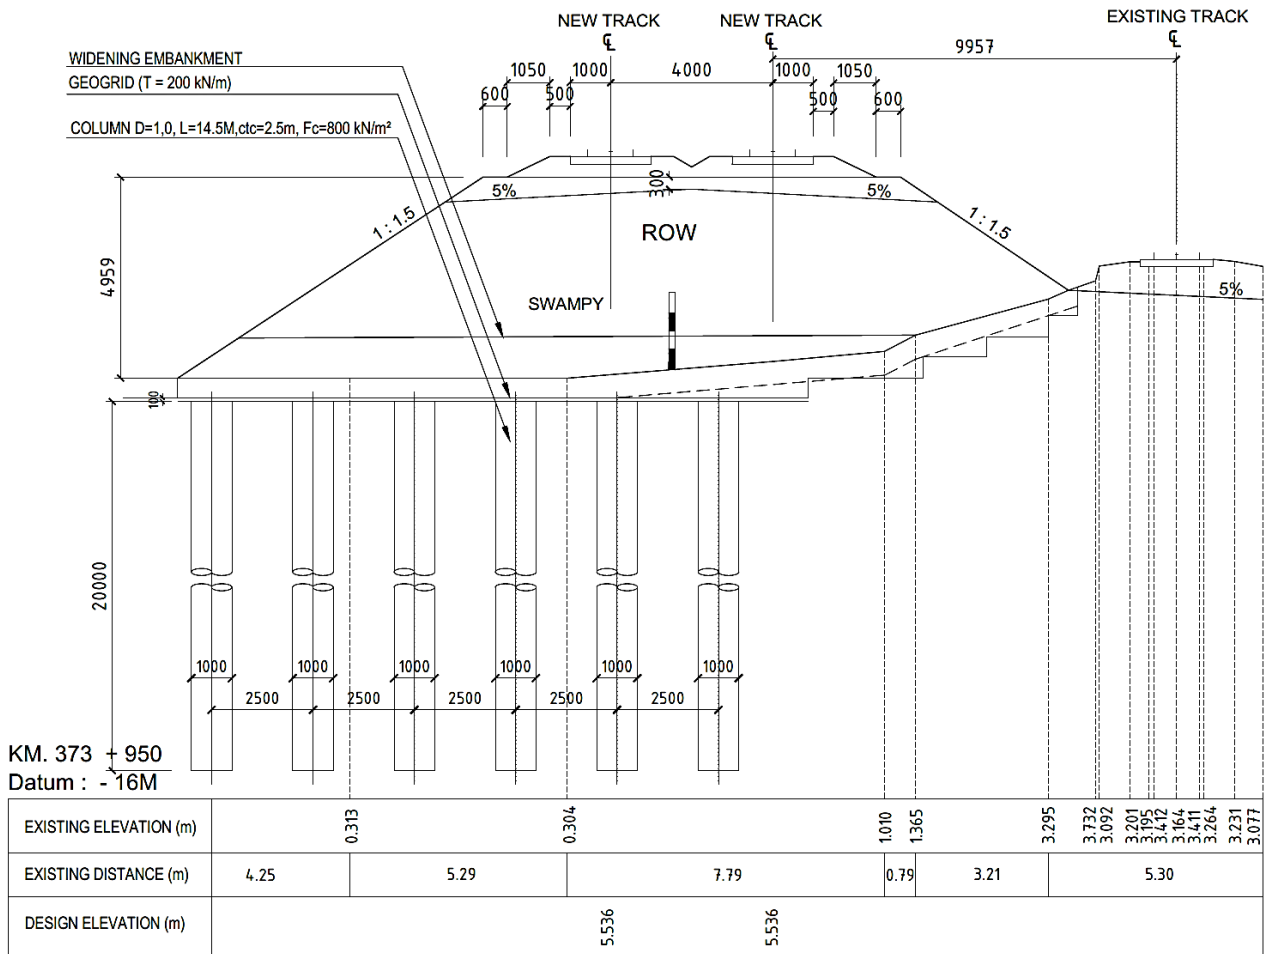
Typical cross-section of the new double-track embankment system (STA 373+950)
